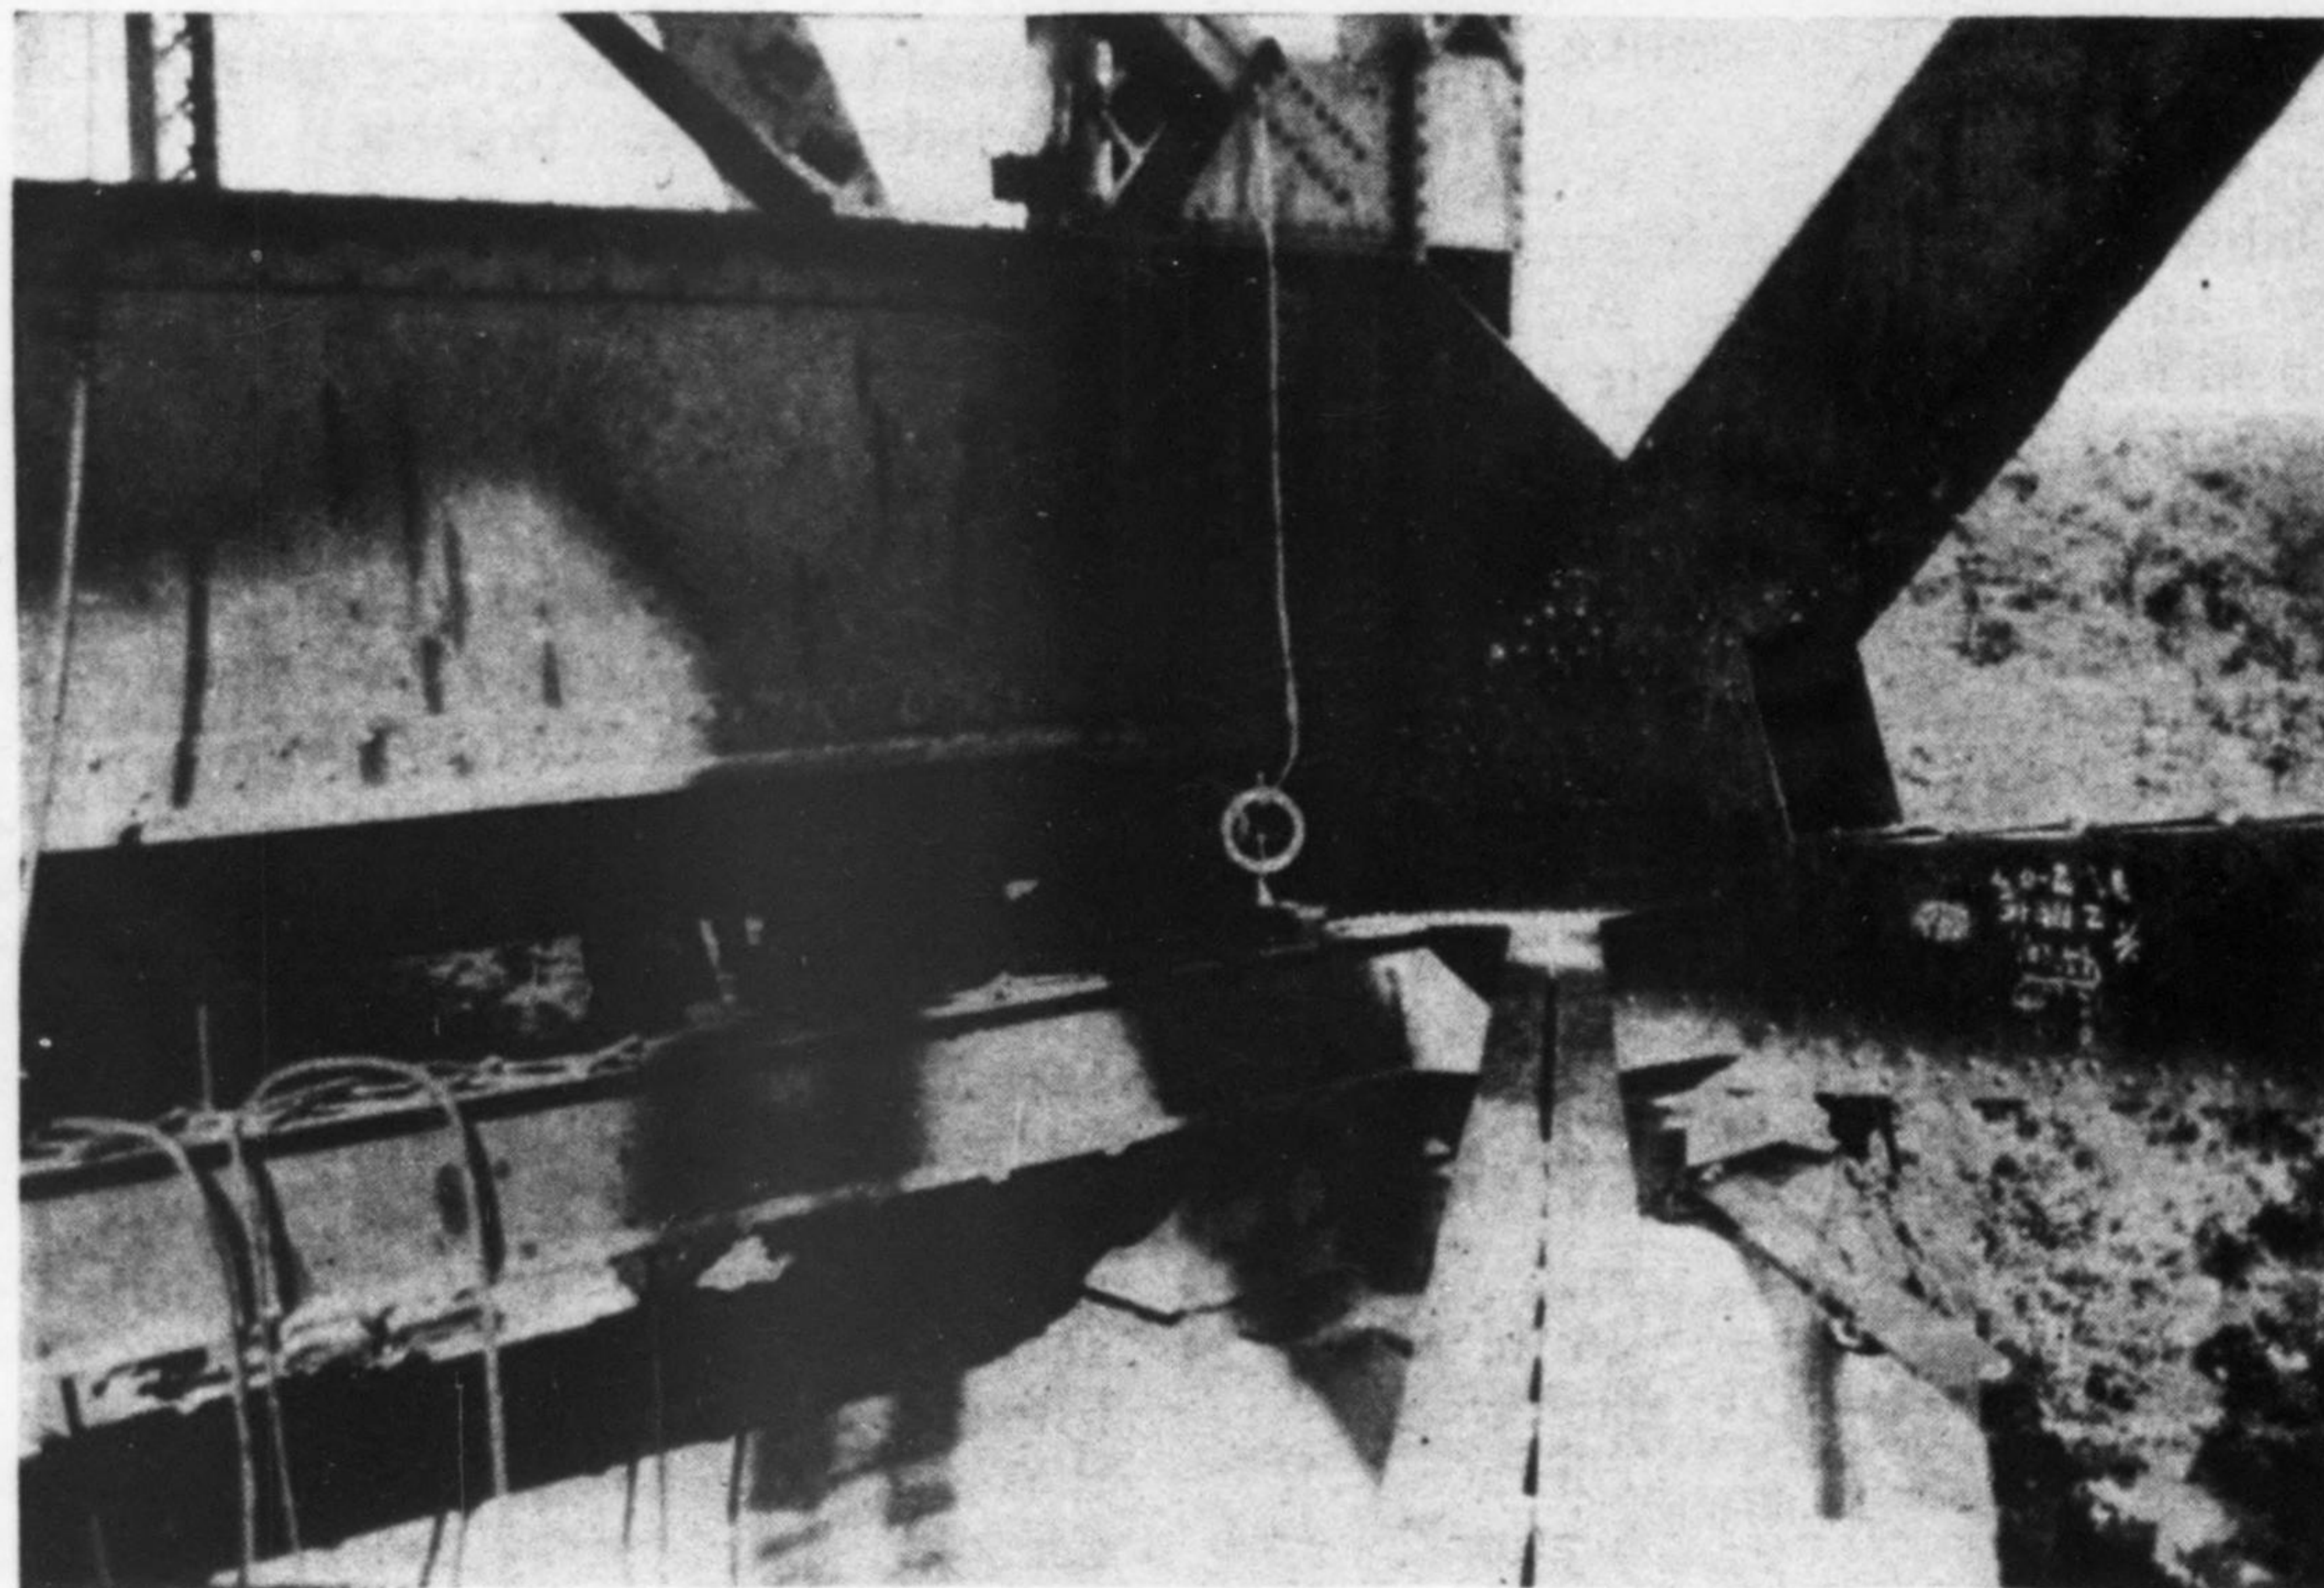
WEIGHING SET-UP on one of the Cape Cod bridges, showing special reinforced girder installed to provide a jacking reaction and to furnish the means for transferring the bridge load to the proving rings. A rope is attached to the proving ring as a precaution against its falling from the pier.
